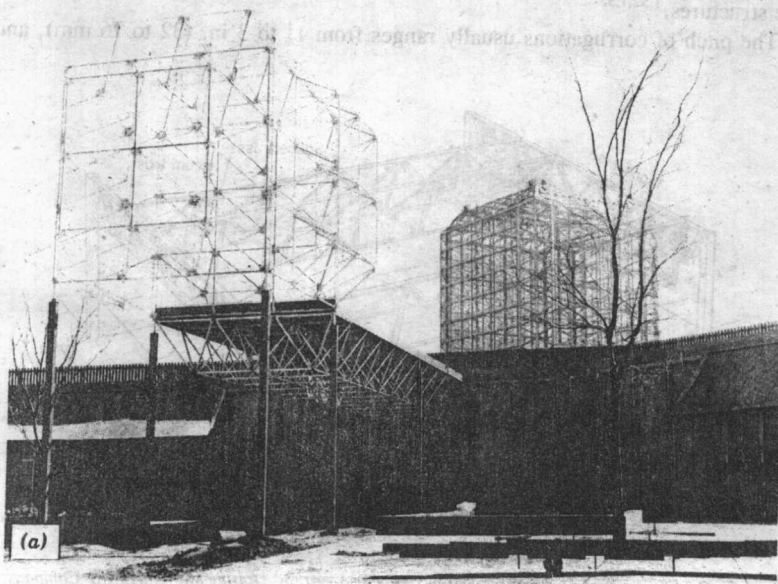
Cold-formed steel sections used in space frames. (Unistrut Corporation.)
